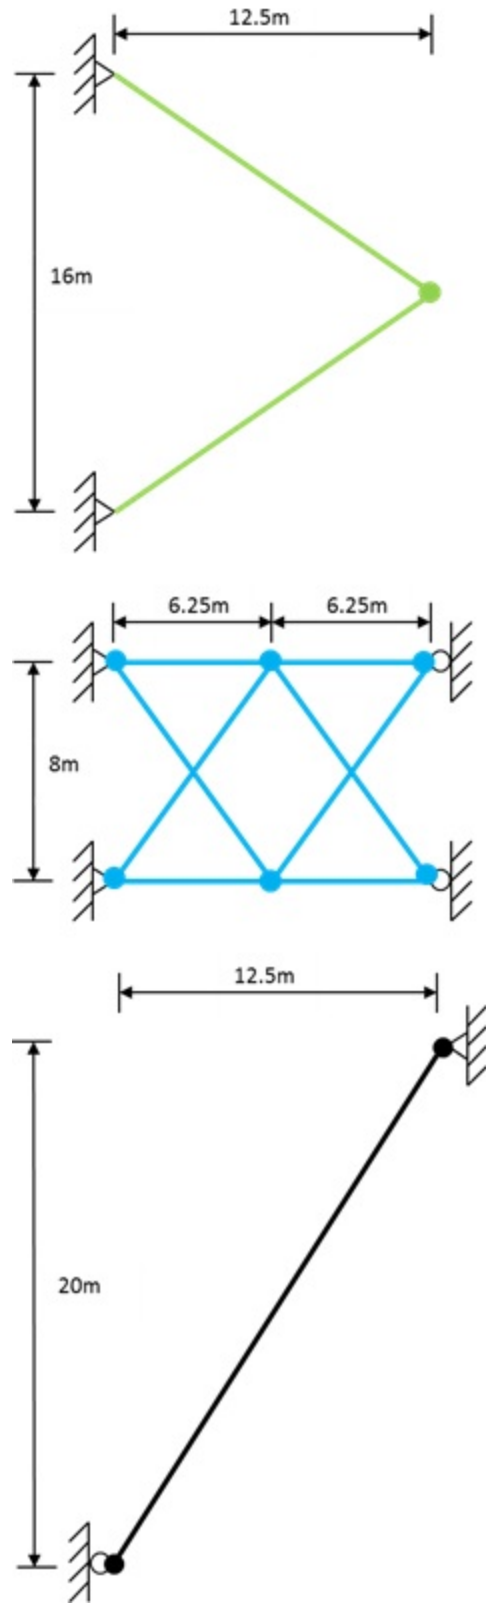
Generic skyscraper - outrigger truss, belt truss, and diagonal systems
